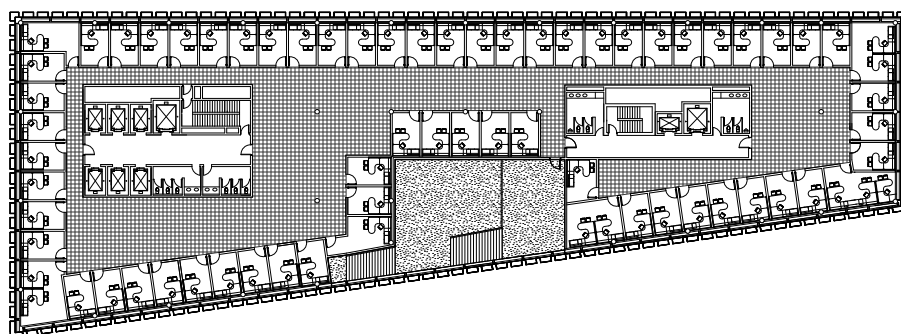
Mahler 4, Amsterdam, typical floor plan (Source: Rafael Viñoly Architects)
